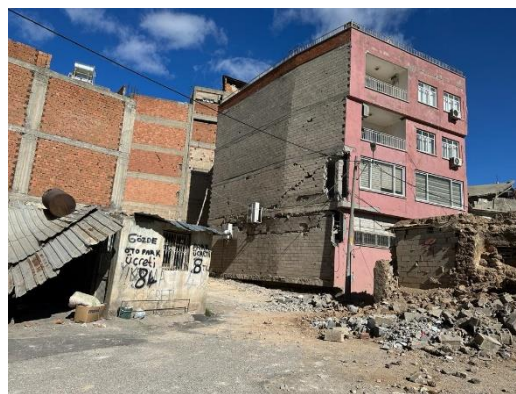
Damaged masonry walls in Adiyaman city center
